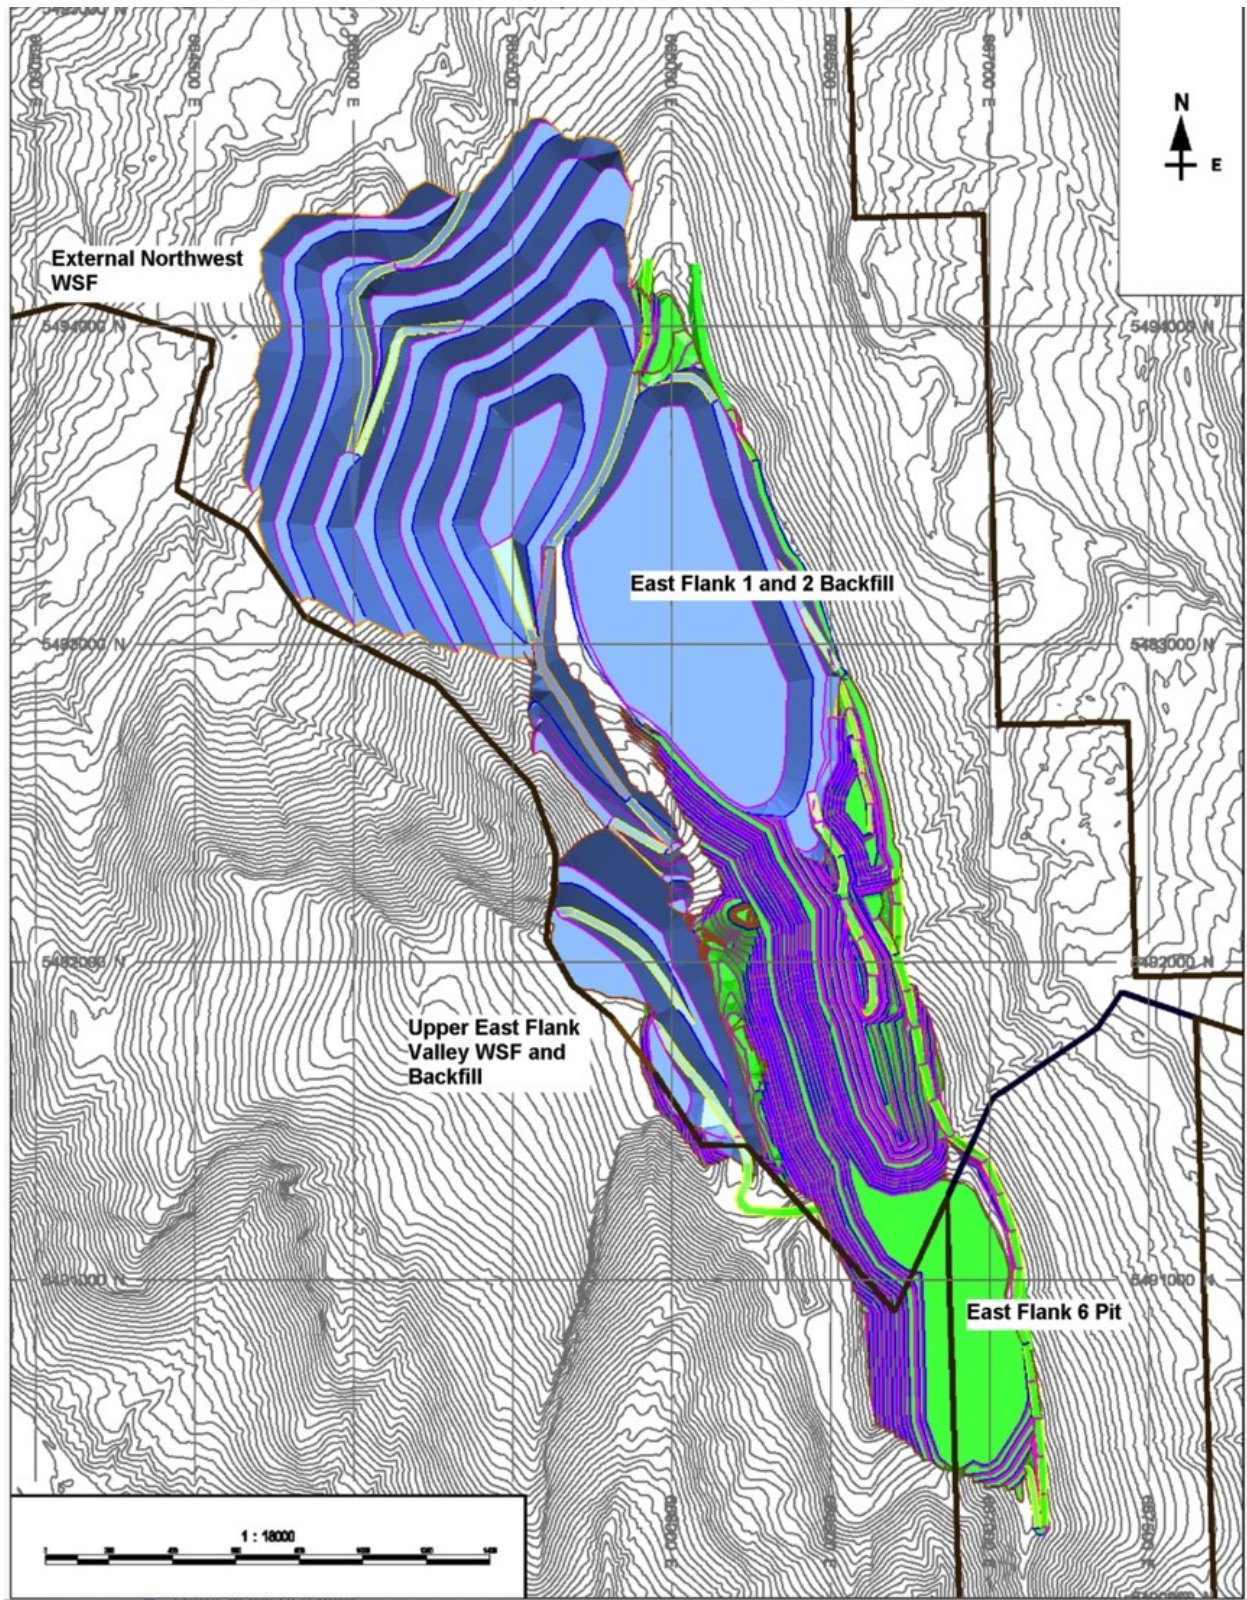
Overall proposed mine plan for Tent Mountain Mine.
